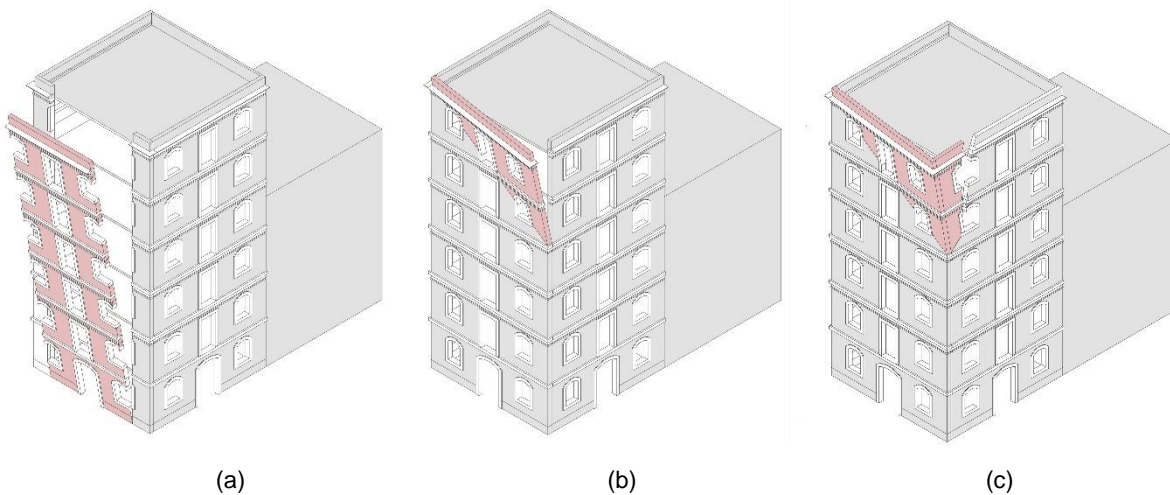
Local mechanisms: (a) Vertical strip overturning in the front facade, (b) Partial overturning, triangular shape, (c) Failure of the corner
